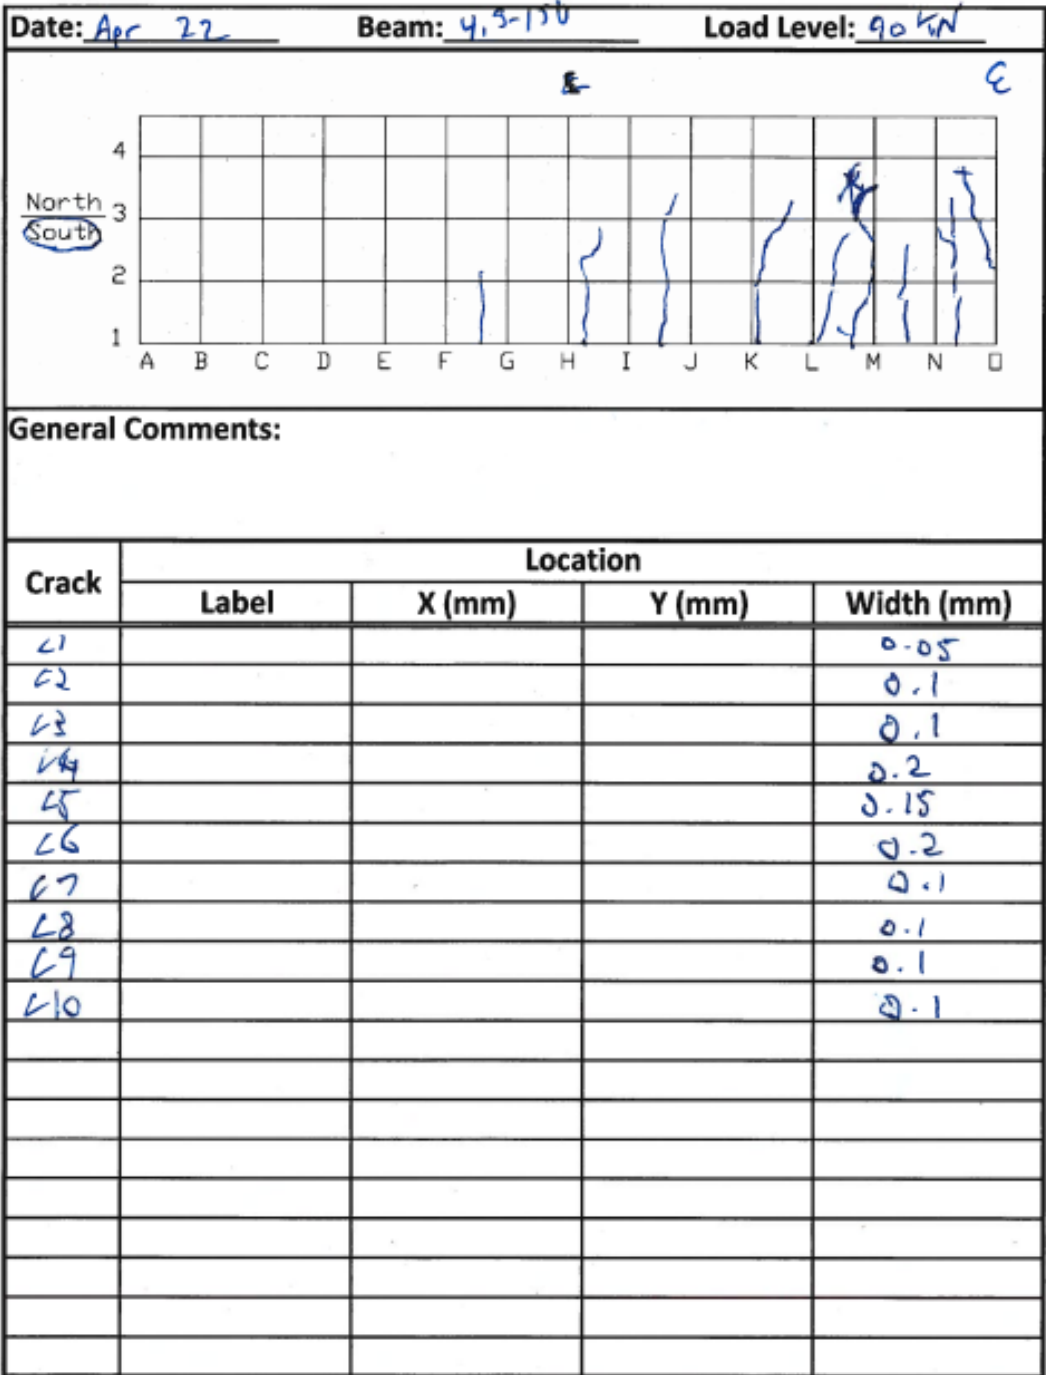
Crack tracking of south side of BM 4.5-150 at 90 kN
